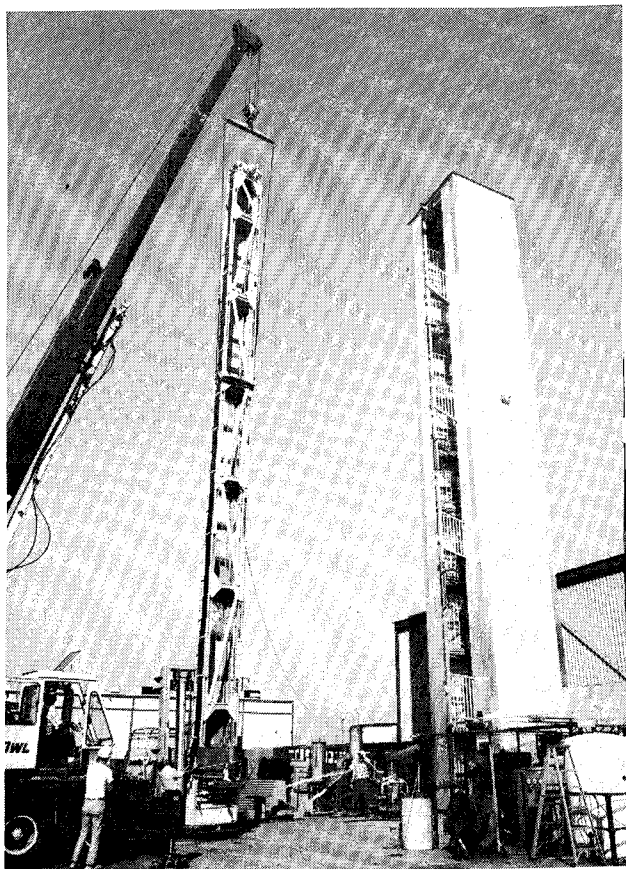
Pilot Plant Panel Being Installed in Test Tower
